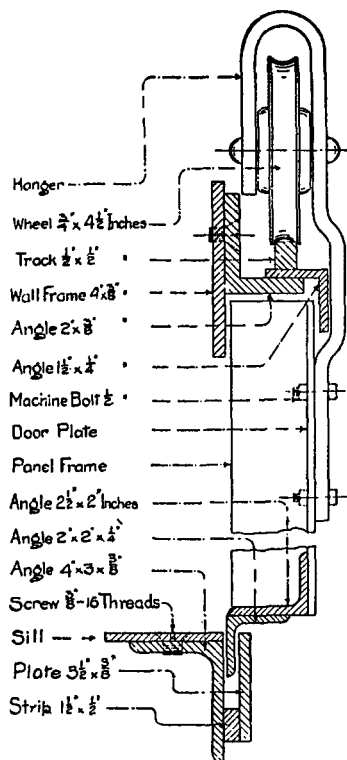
Detail Showing Hanger and Top and Bottom Channels for Sliding Plate Steel Doors.
